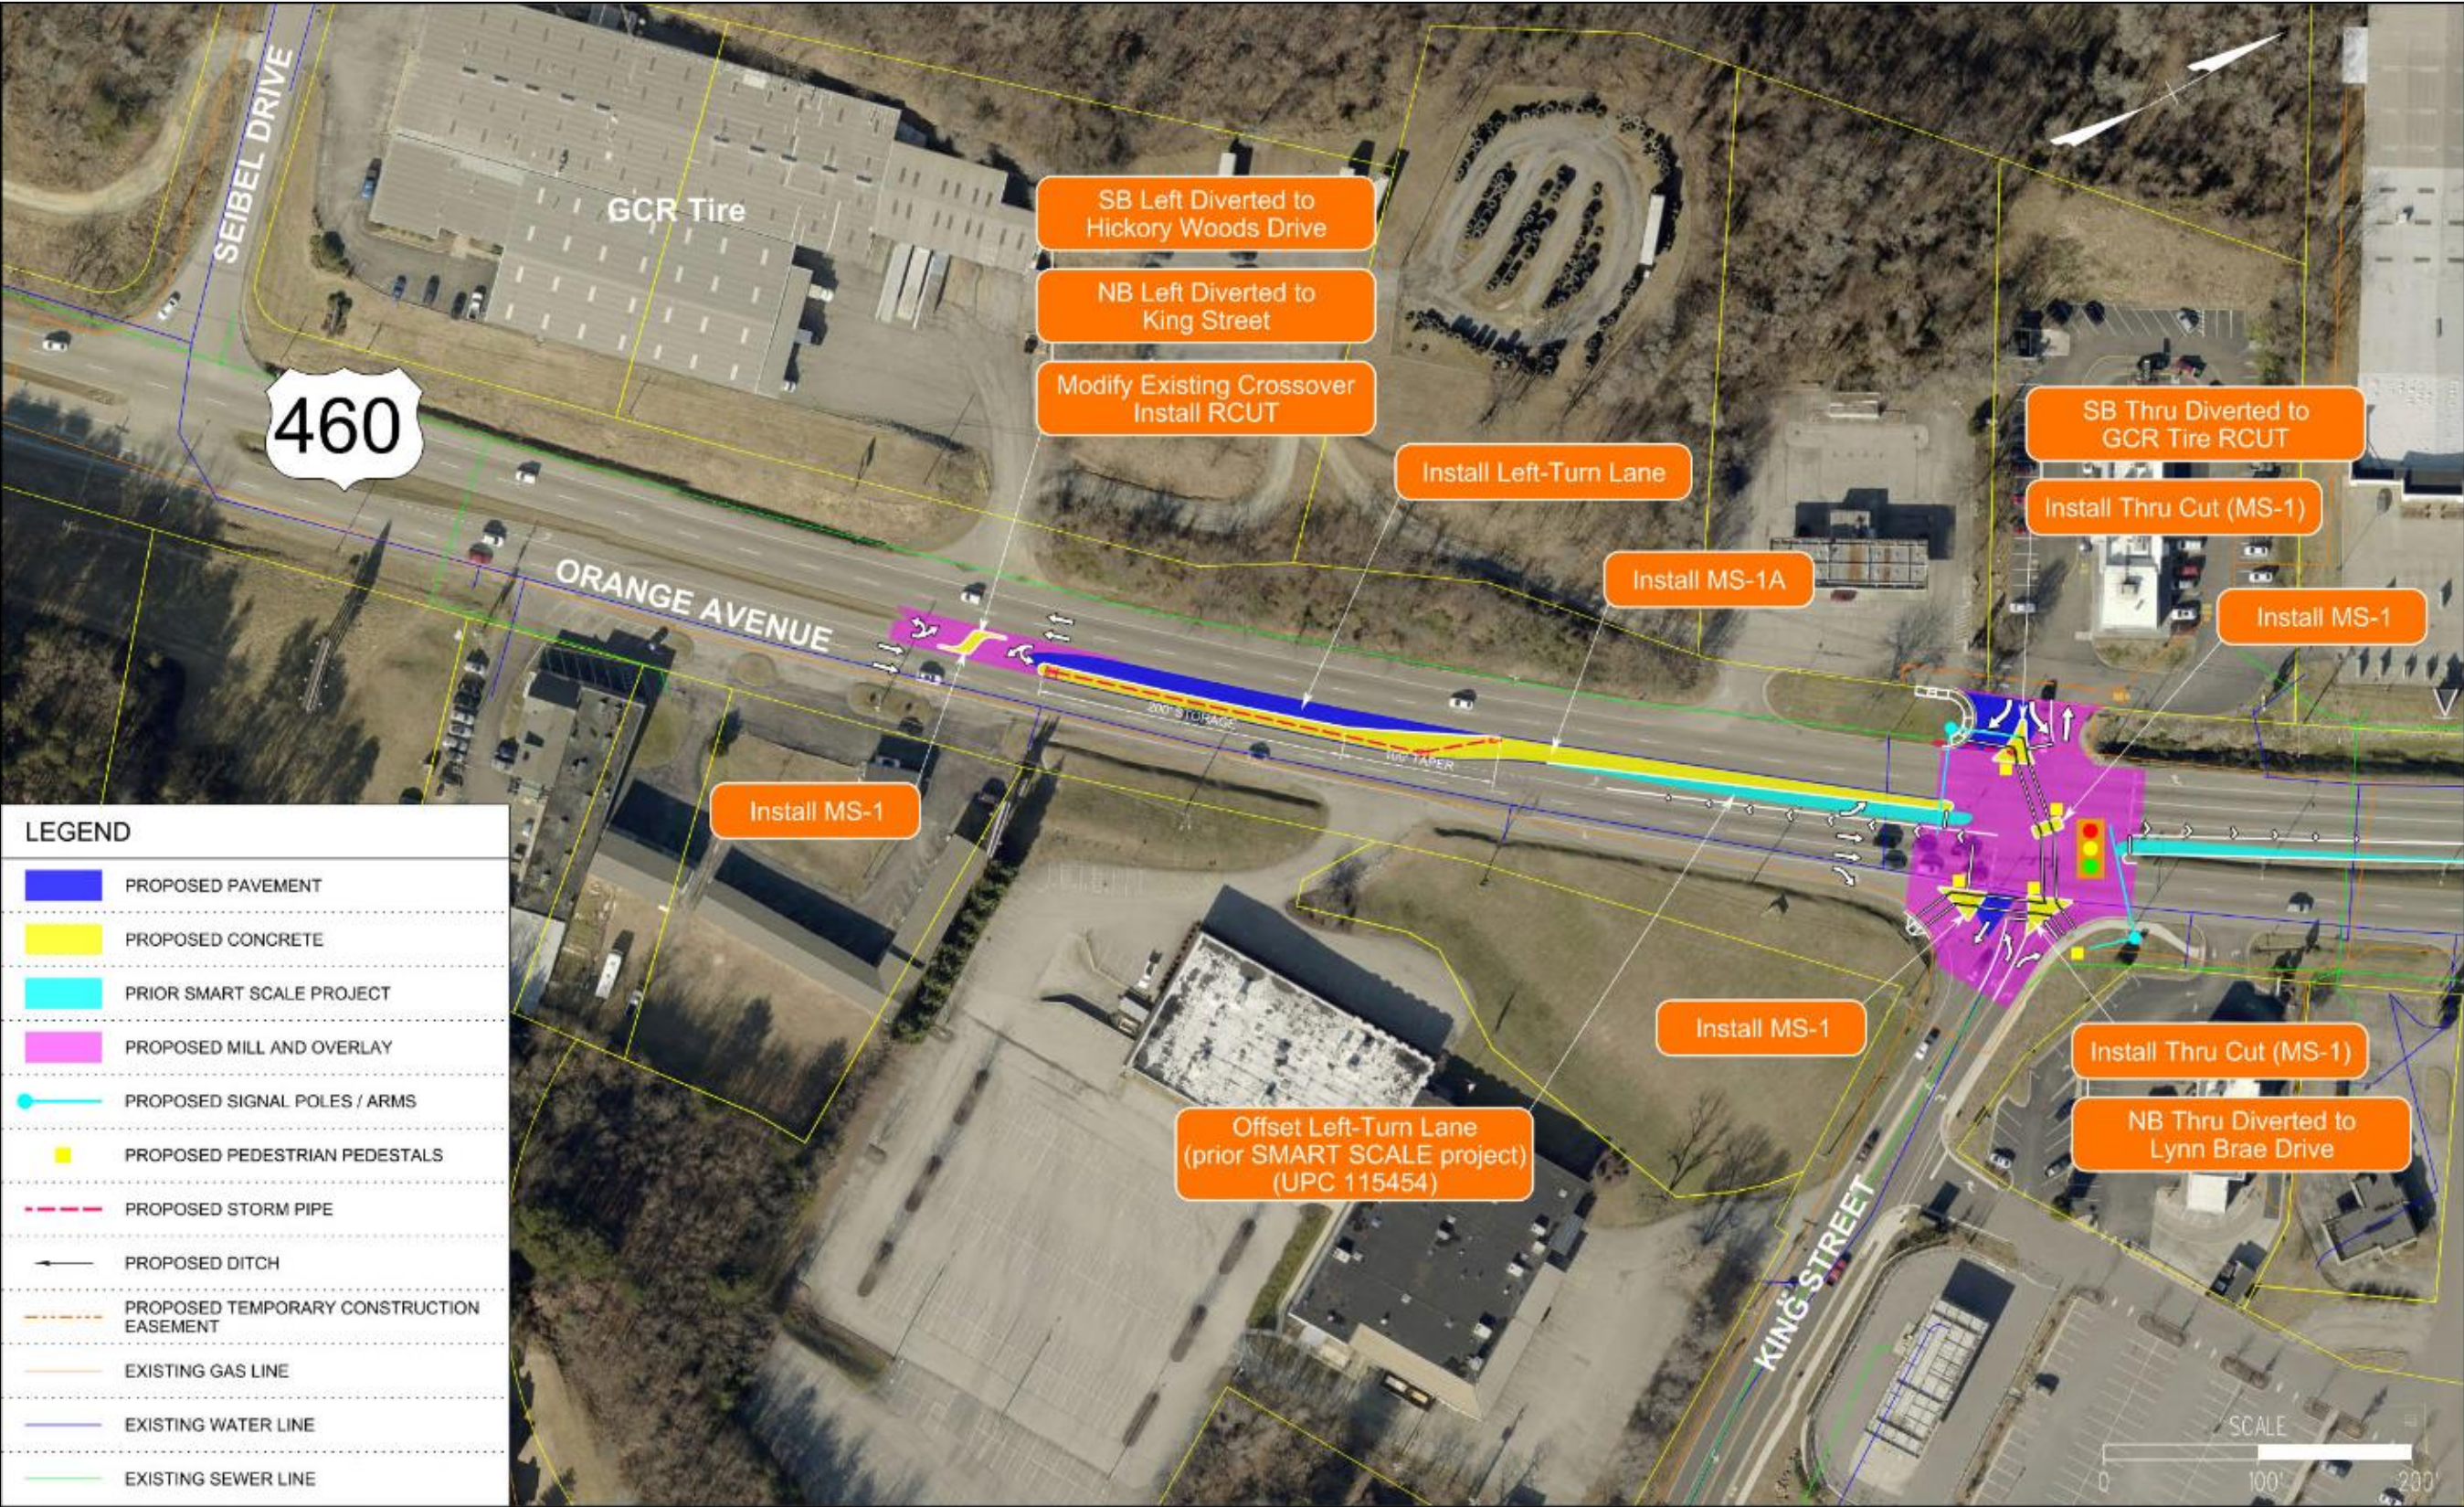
Route 460 from Median Opening West of King Street to Lynn Brae Drive (Sheet 2 of 2)
